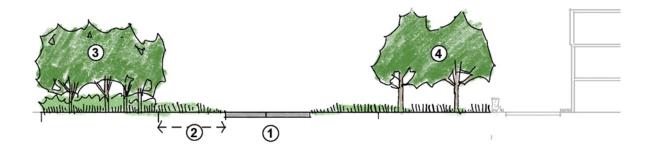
Cross section of northern section of Outer Link Road (40m corridor
